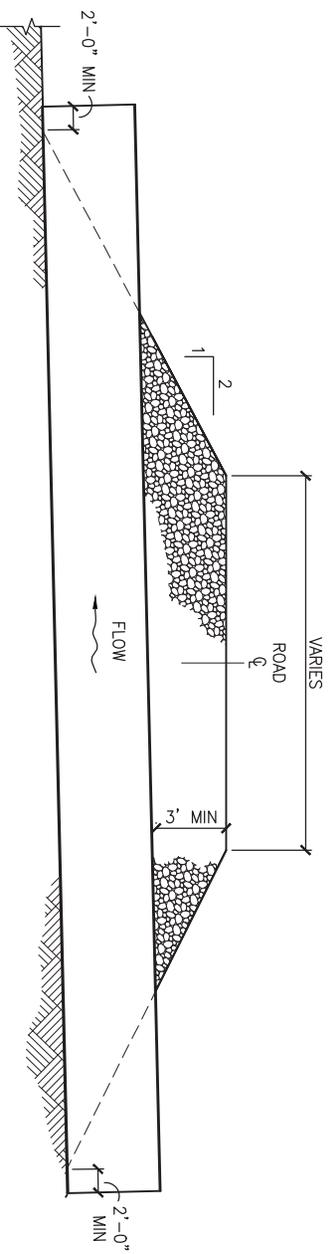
STREAM 27 CULVERT PLAN & PROFILE - REMOVED
